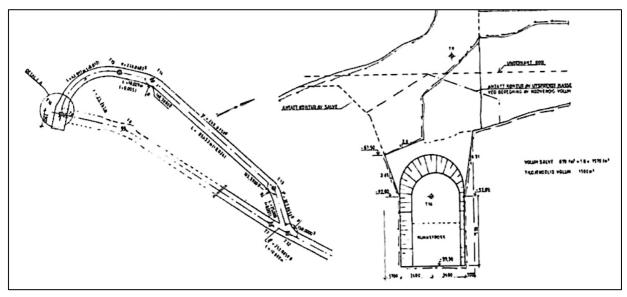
An illustration of tunnel and tunnel piercing design at Hjartøy.
